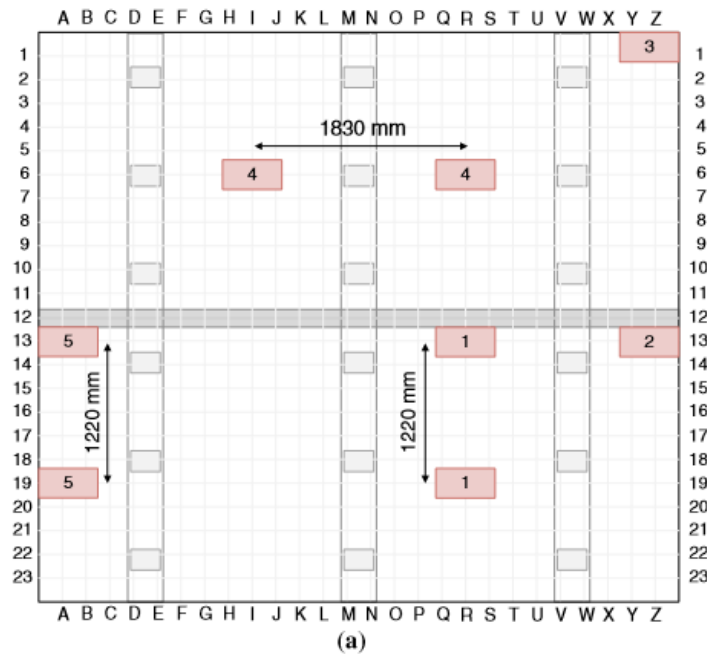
Plan view of the bridge deck slab (Gar et al. 2013)
